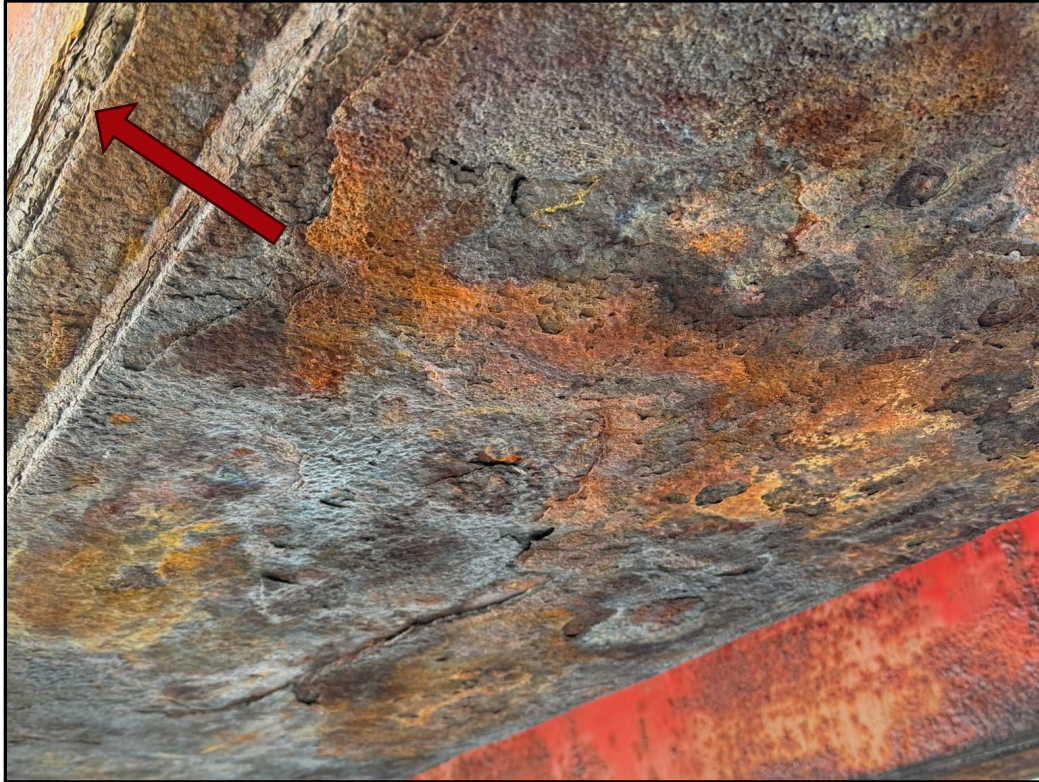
Close-up of laminar corrosion and deteriorated weld on barge ramp girder bottom
